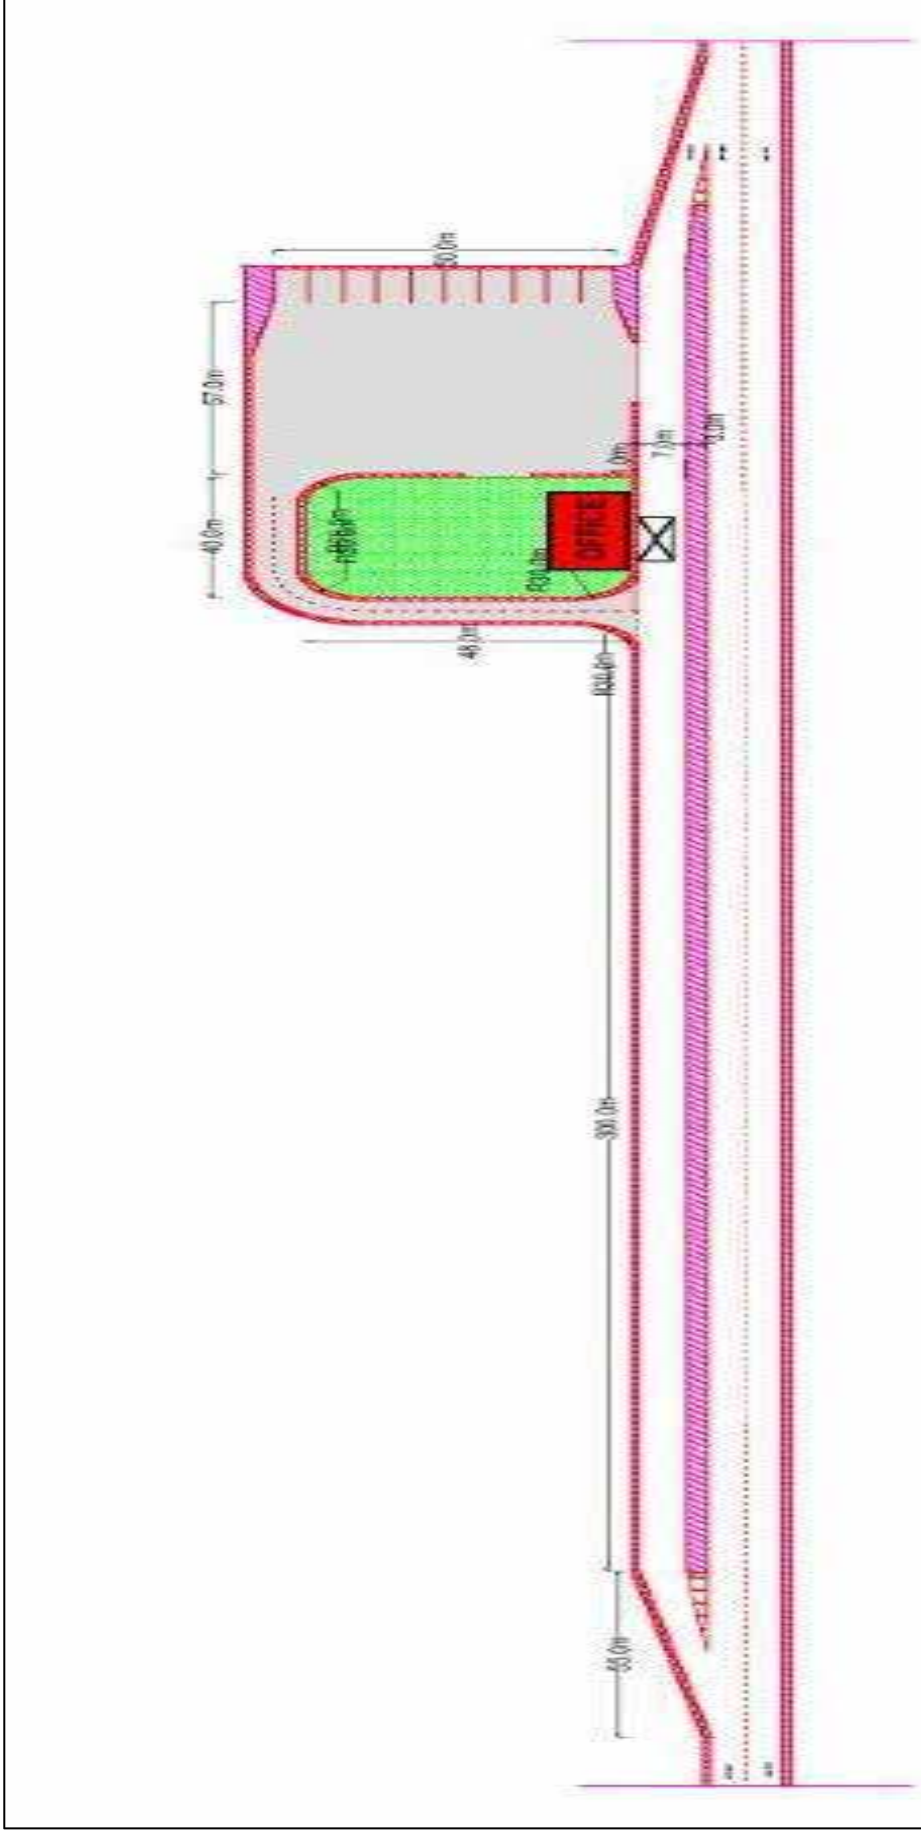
Layout Plan of the Weigh-Bridge Station
